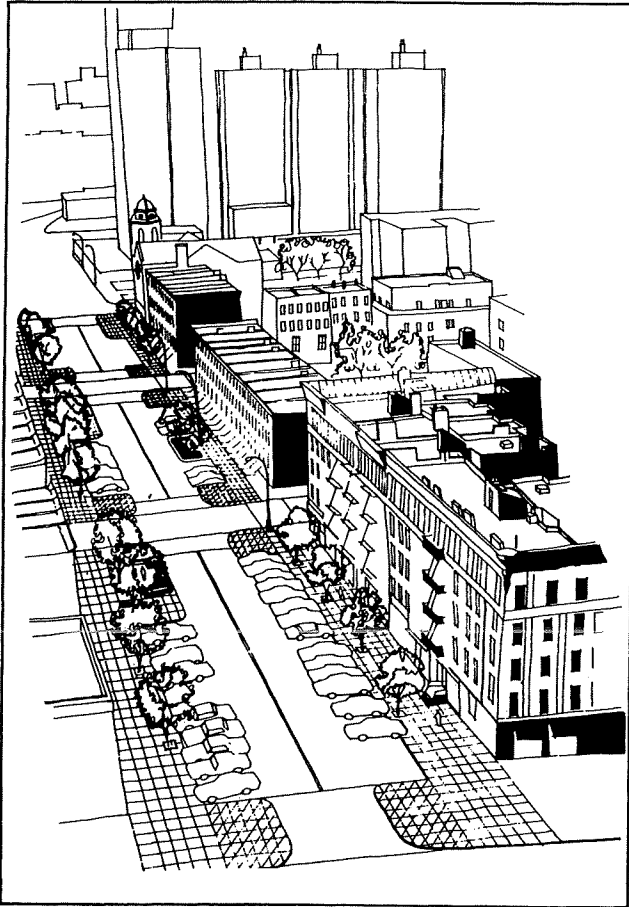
Illustrative conversion of a street to a parking lot. Neckdowns protect 90 degree angle parking and provide space for plantings and amenities.
